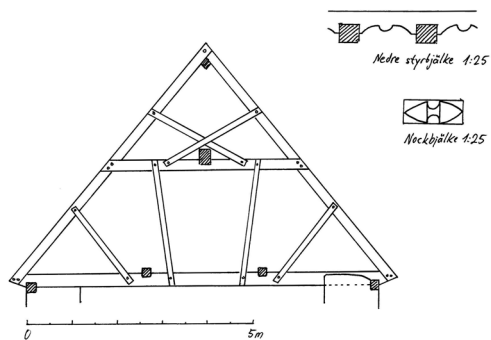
Section of the roofing above the nave of Bälaryd with three decorated steering plates and ridge purlin. Drawing by R. Gullbrandsson.
